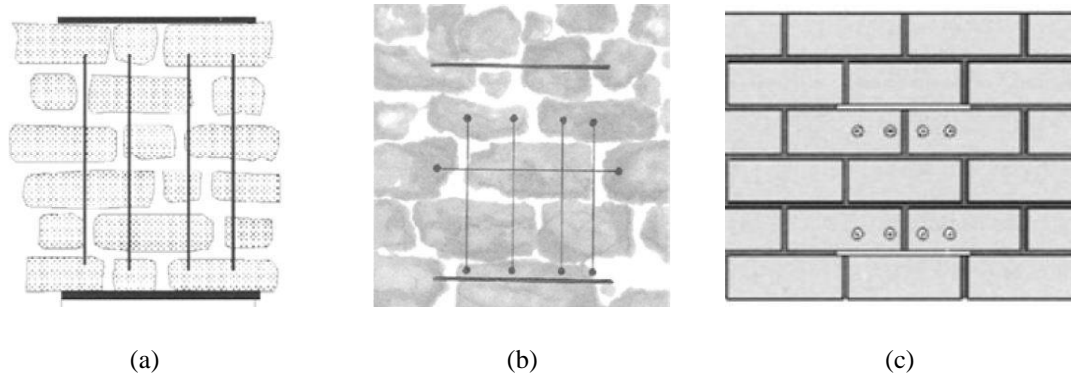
6. Double flat jack test setup according to RILEM for: handmade brick masonry (a), irregular stone masonry (b) and modern brickwork (c).
